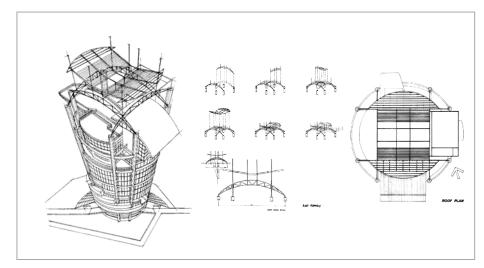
Detailed Drawing of the Movable Shading of Misiniaga Tower in Malizia.
